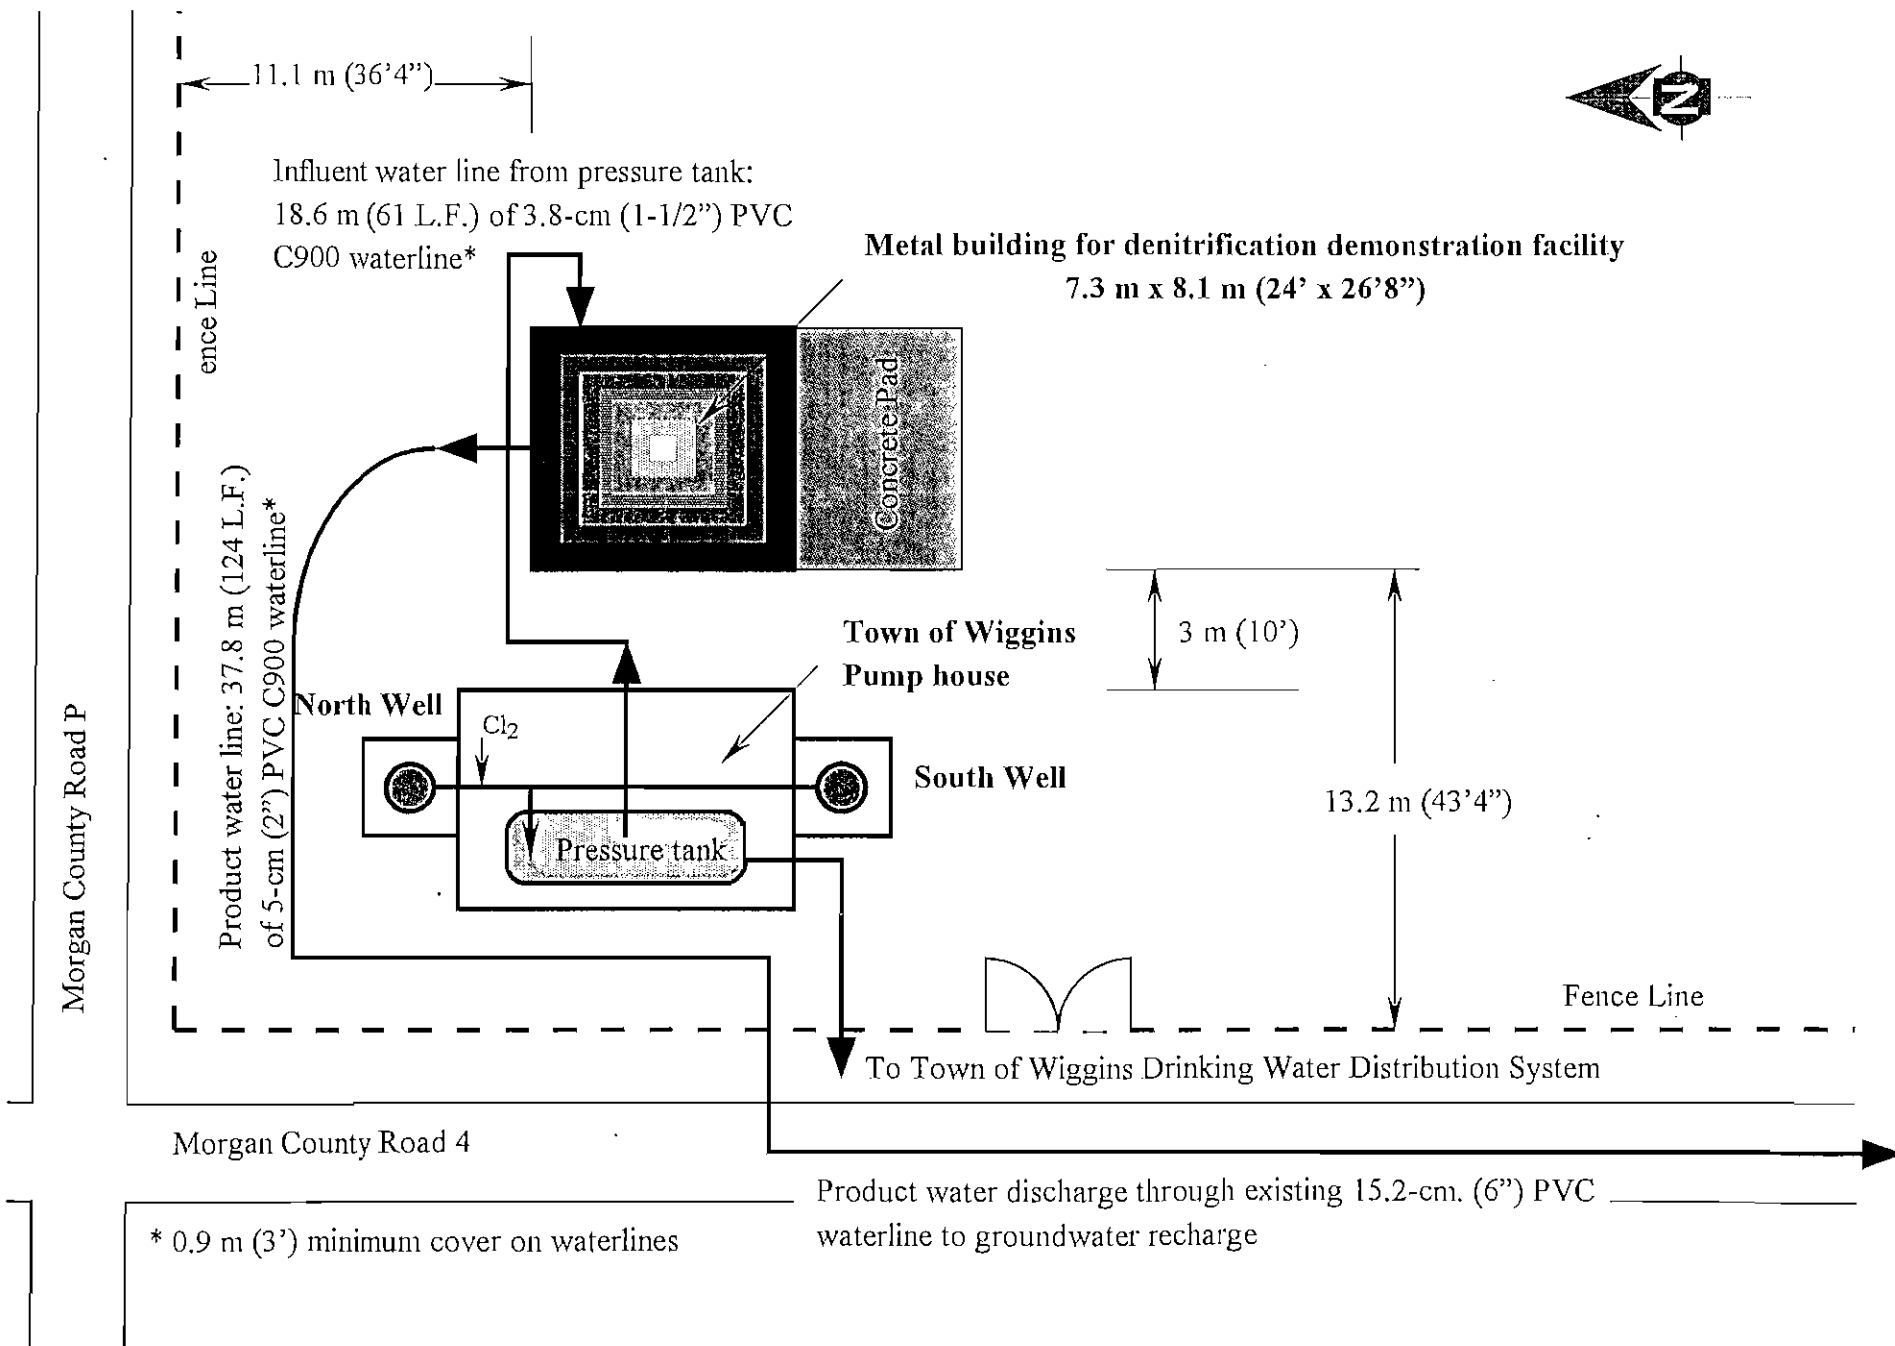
Site plan of drinking water denitrification demonstration facility adjacent to the Town of Wiggins pump house for the municipal drinking water system
